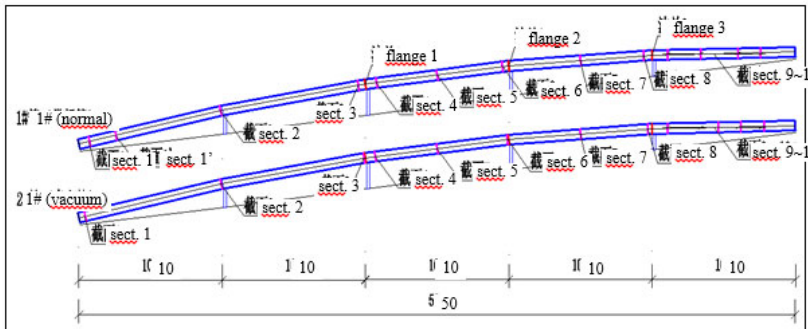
Sizes of the testing arch rib tubes (unit: m).
